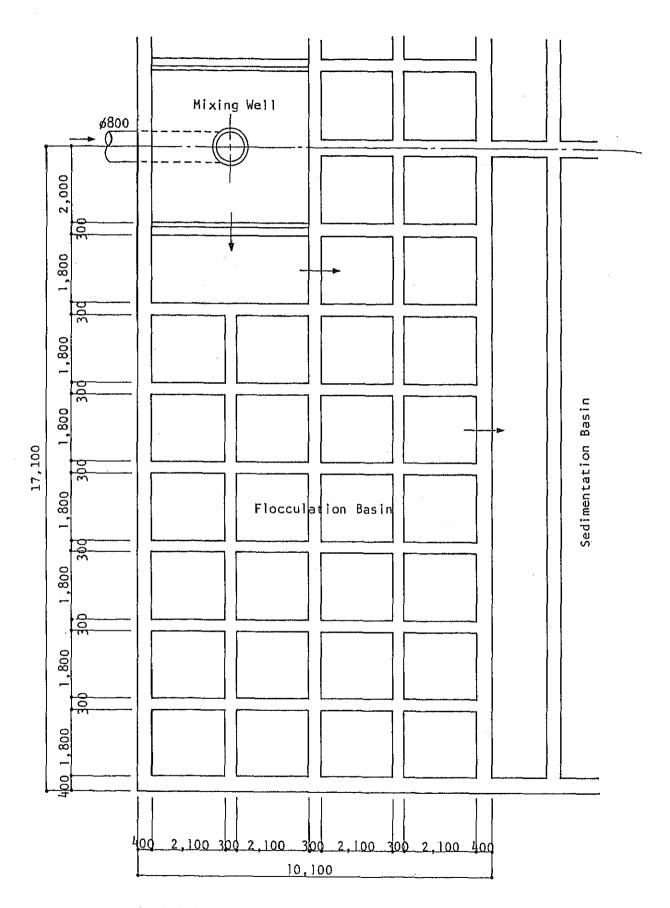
<u>MIXING WELL AND FLOCCULATION BASIN</u> (Northeast Plant)
